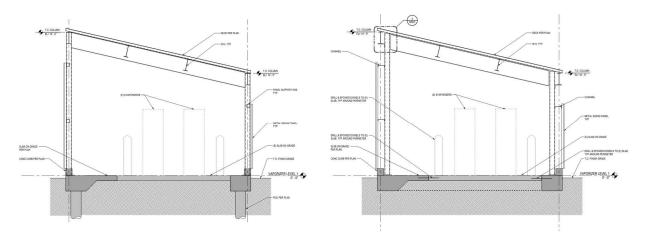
Vaporizer Canopy Foundation & Framing Options
